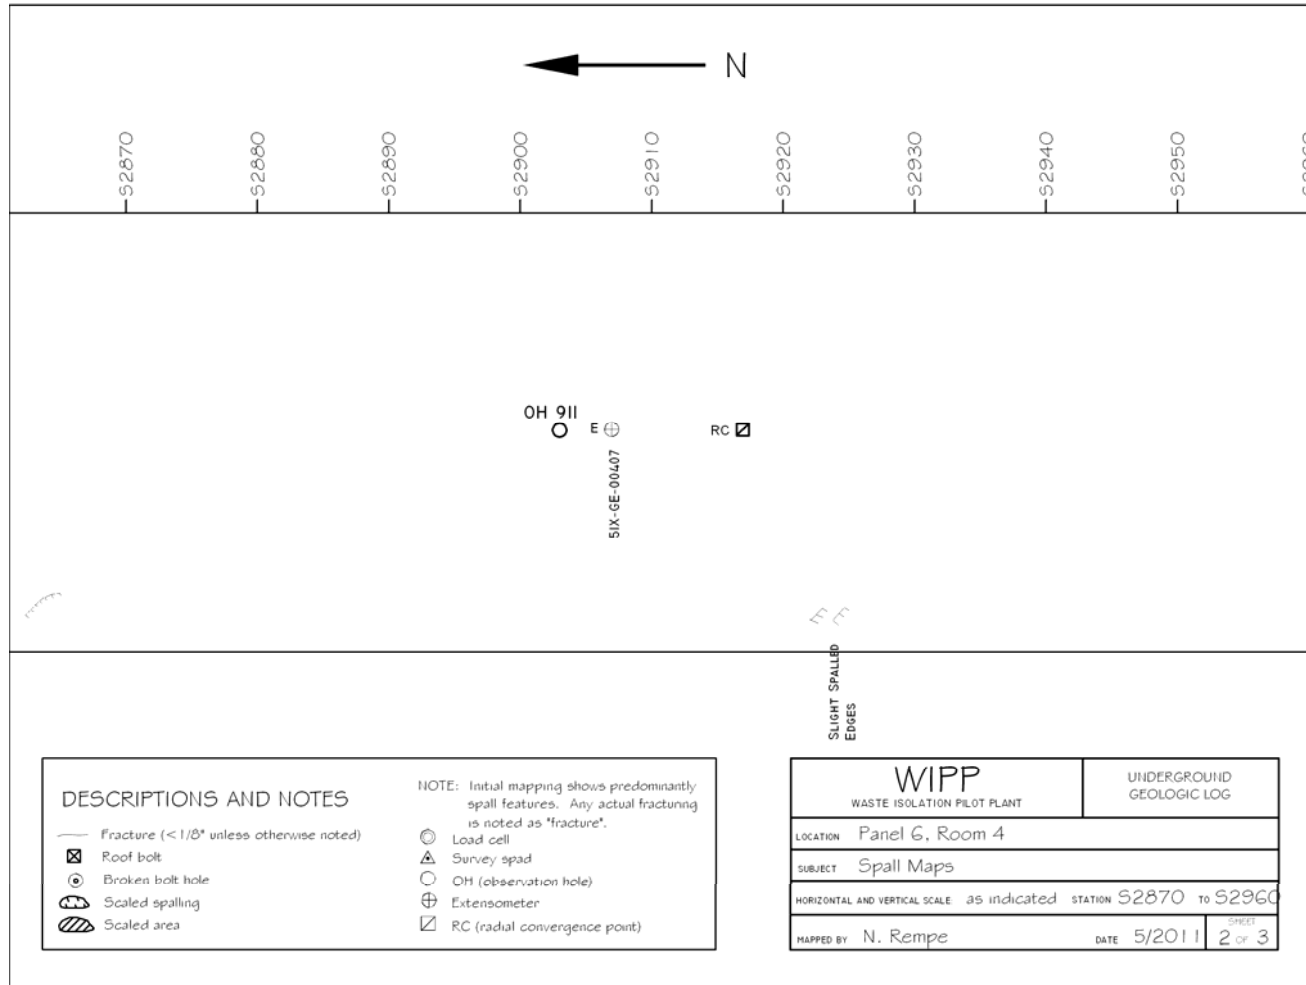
Panel 6 Room 4, S2770-S3060 Roof Fractures (Sheet 2 of 3)
